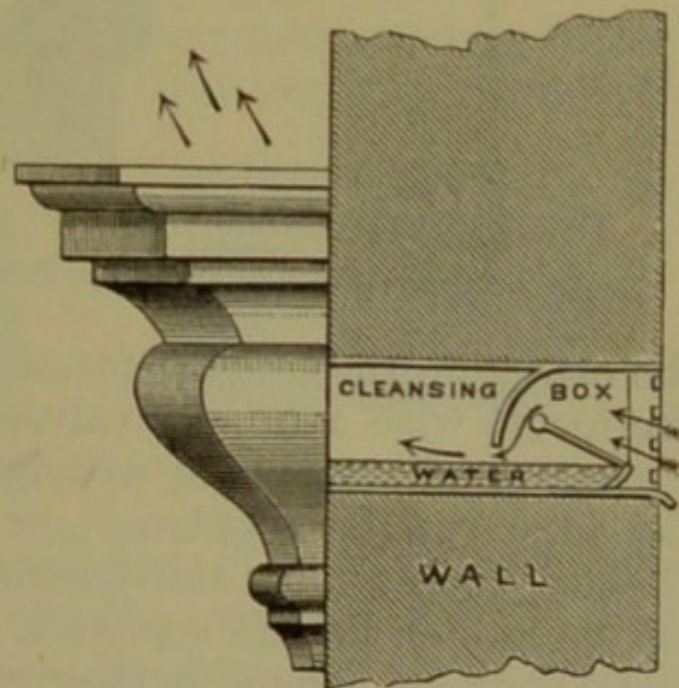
Ornamental Wall Bracket Inlet Ventilator, with Arrangement for Purifying the Entering Air.
